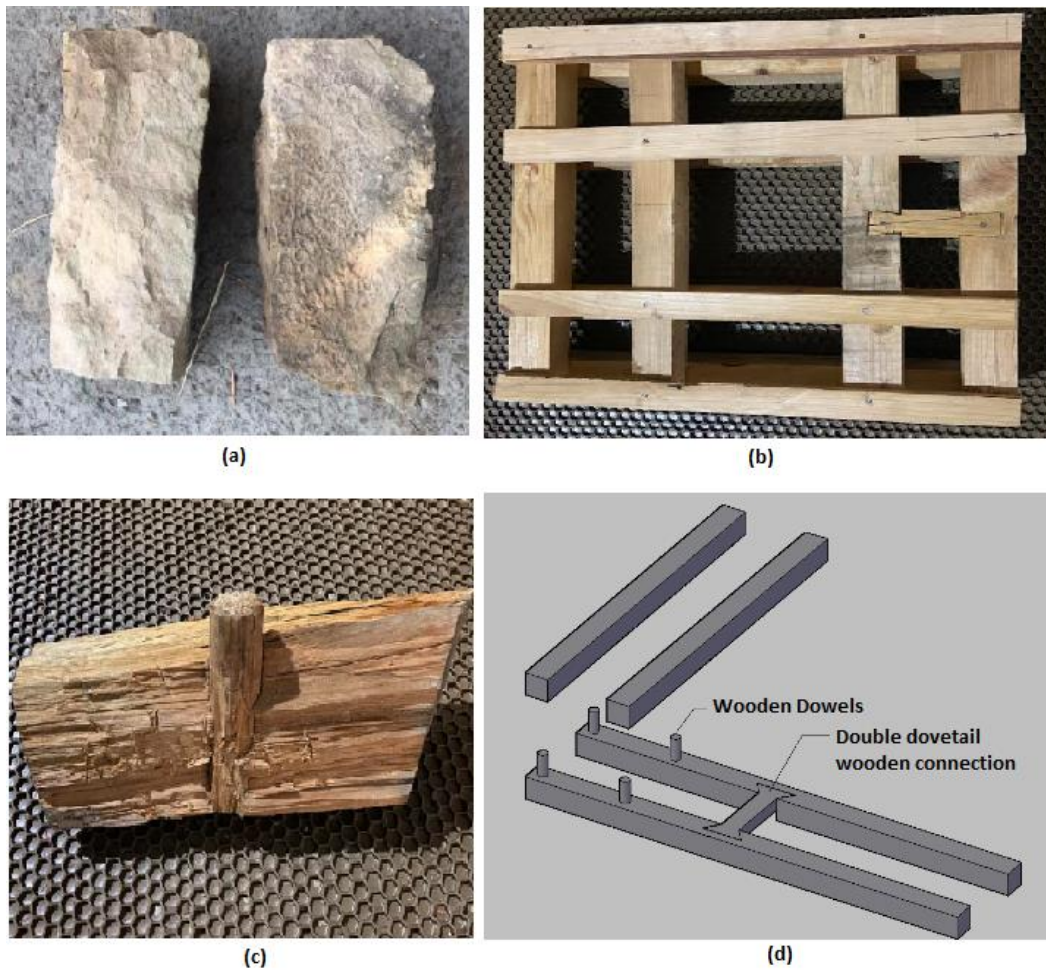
a Rubble stone collected from the site, b model of wooden double dovetail connection made by local mason, c wooden dowel in a timber beam obtained from the site d Modelling of connections in wooden frame present in Kath-kuni walls.
